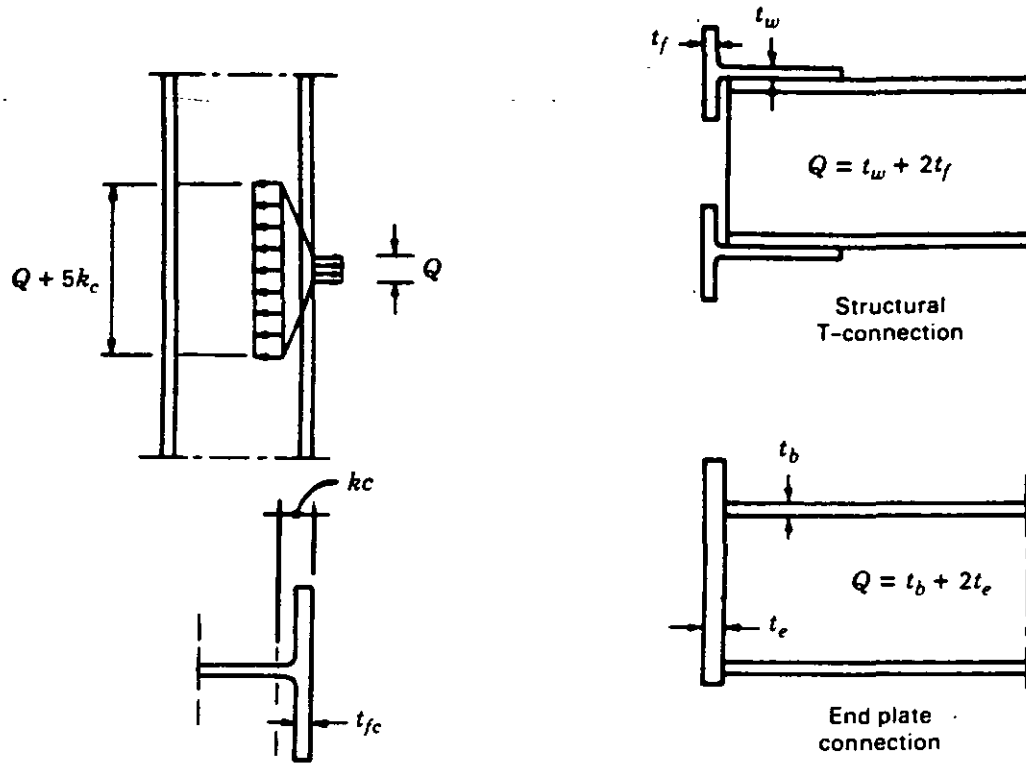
Assumed distribution of compression flange force in bolted beam-to-column connections.
